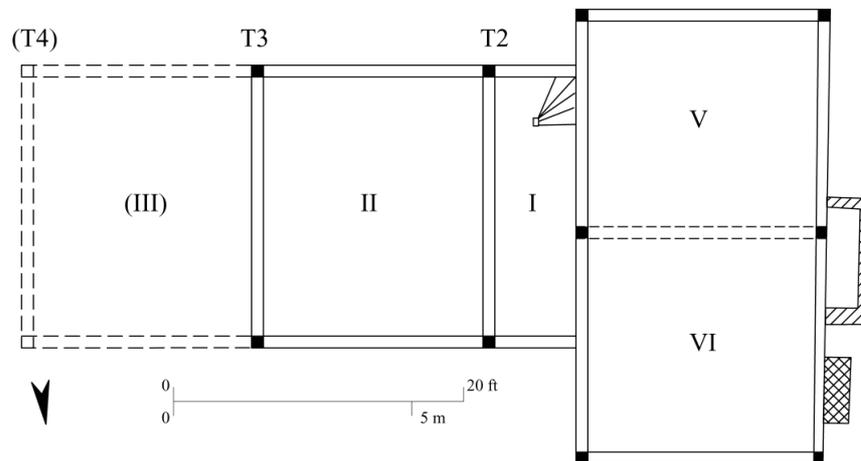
Block plan, showing truss and bay numbering (scale approximate).
